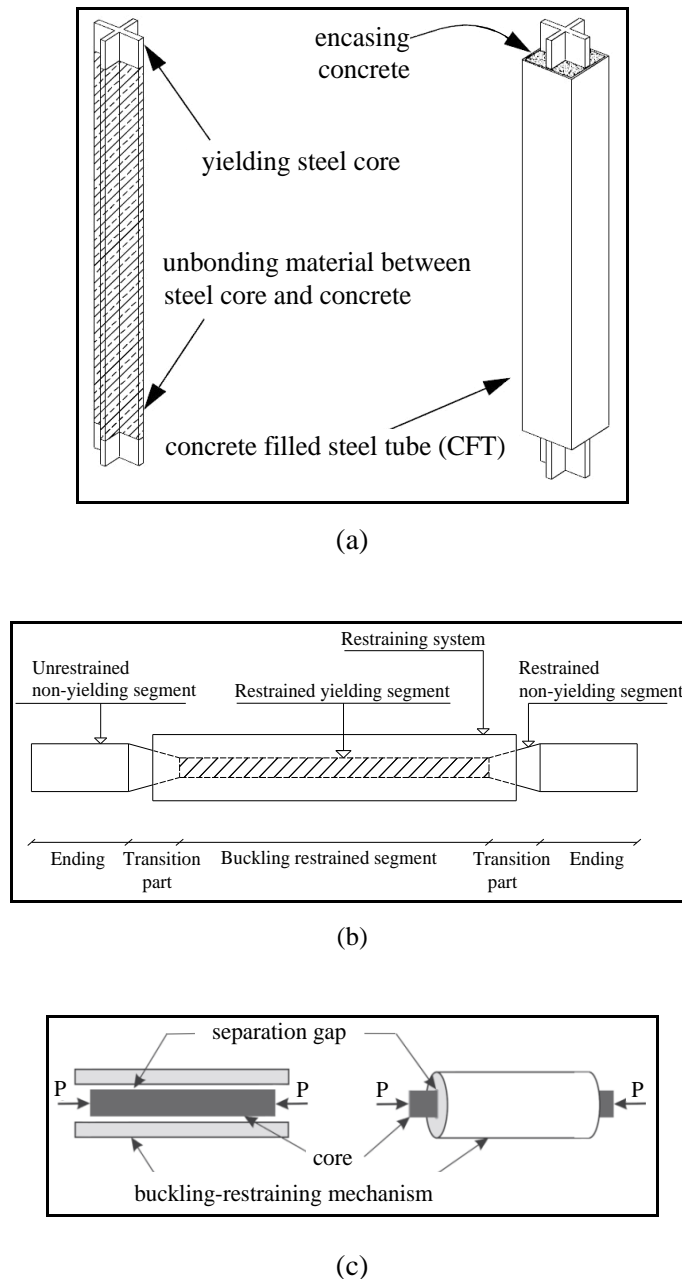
Detail of BRB (a) general structure (Clark et al., 1999), (b) steel core constituent segments and (c) separation gap at steel core-restrainer interface (Korzekwa and Tremblay, 2009)
